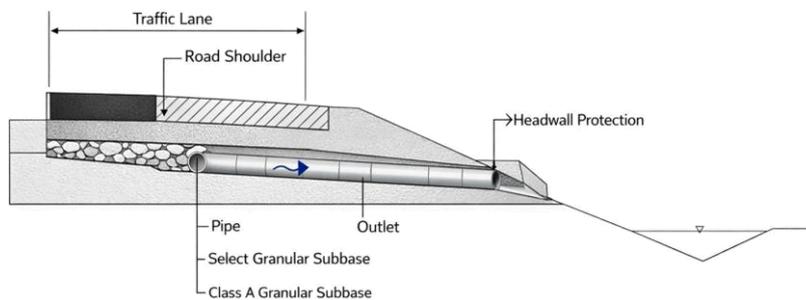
Shallow Drainage System with PVC Pipe Beneath Road Shoulder (MDP 2024).
